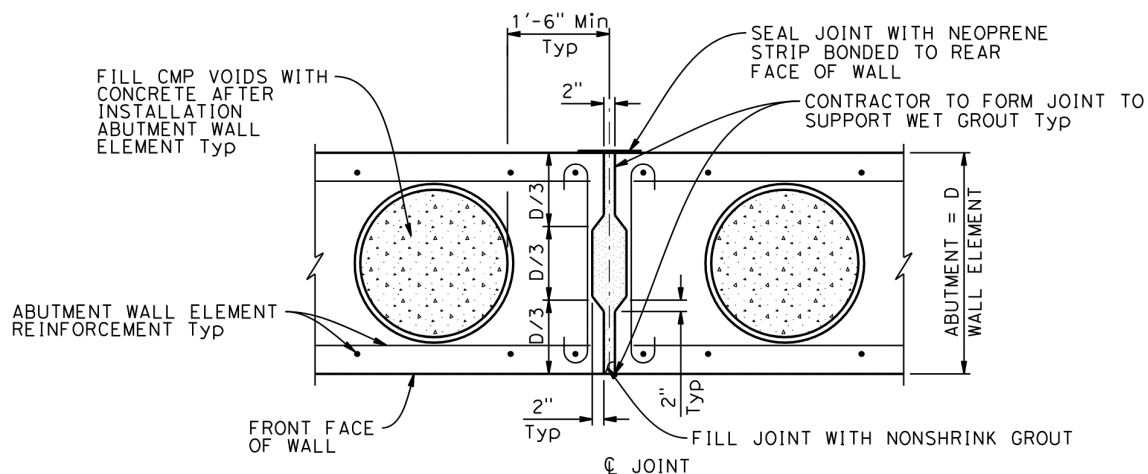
Connection Between Precast Abutment Wall Elements
